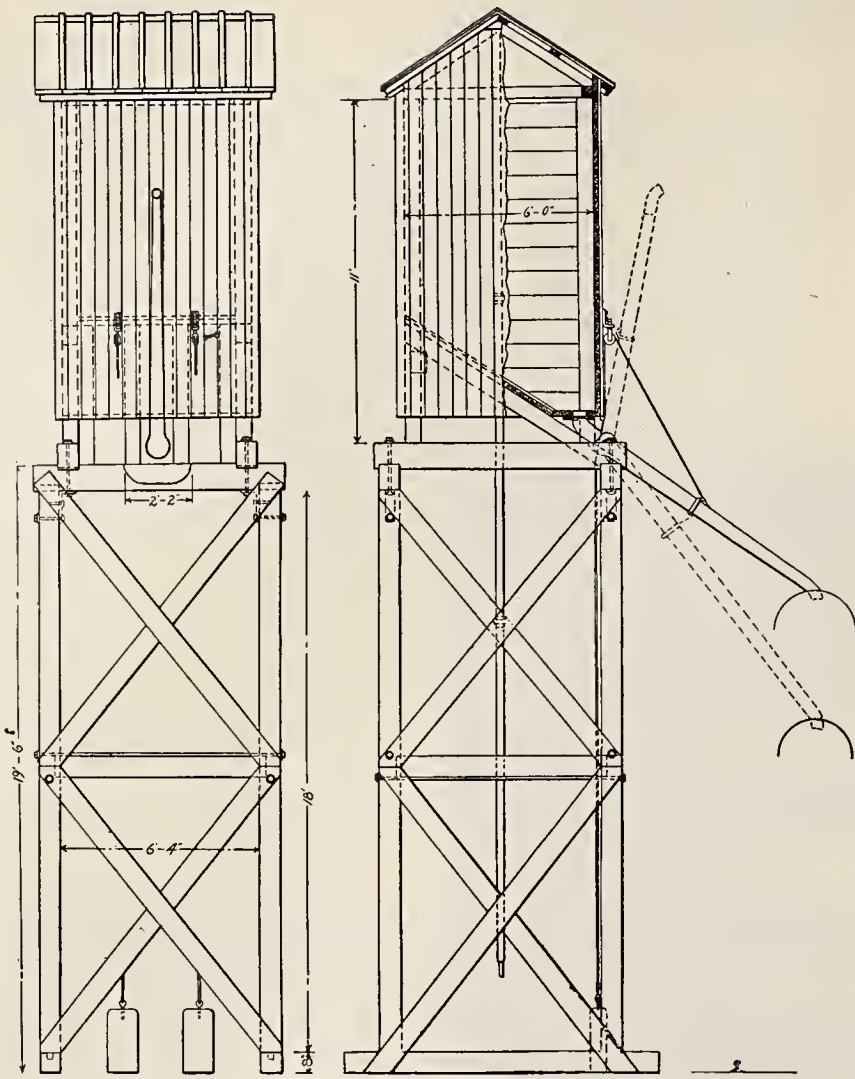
C. M. & St. P. Ry. Elevation of Storage Bin.
